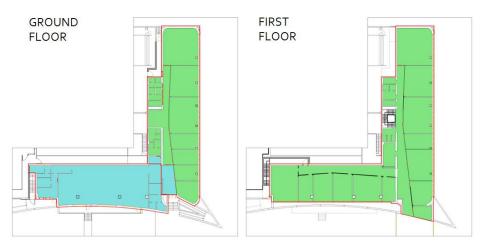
Ground (left) and first floor (right) view of the modeled building.
